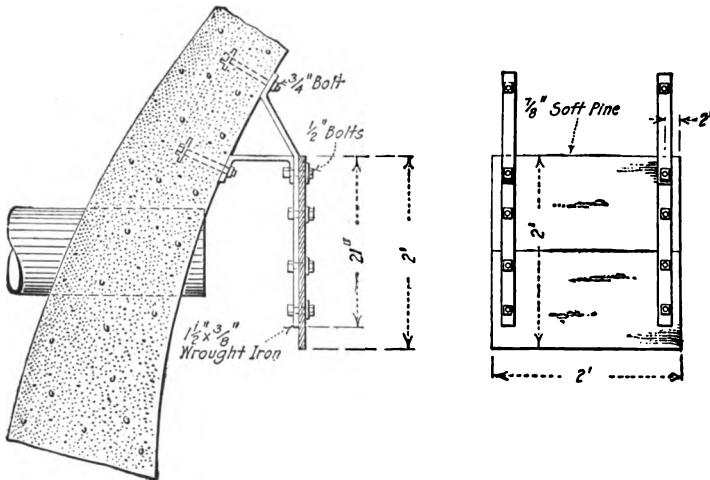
Baffle plate in front of inlet pipe of settling basin.
